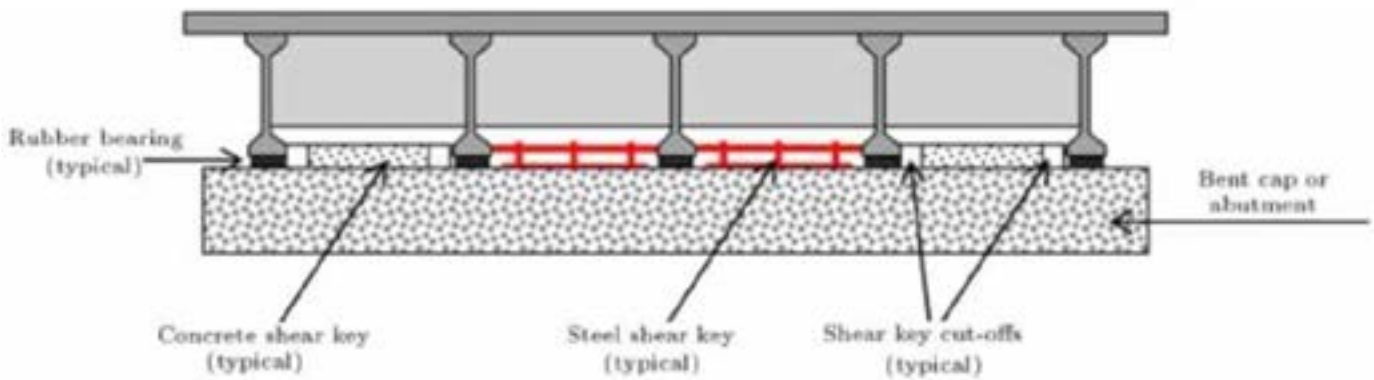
A cross section of a typical bridge showing bearings, shear keys and other structural elements
